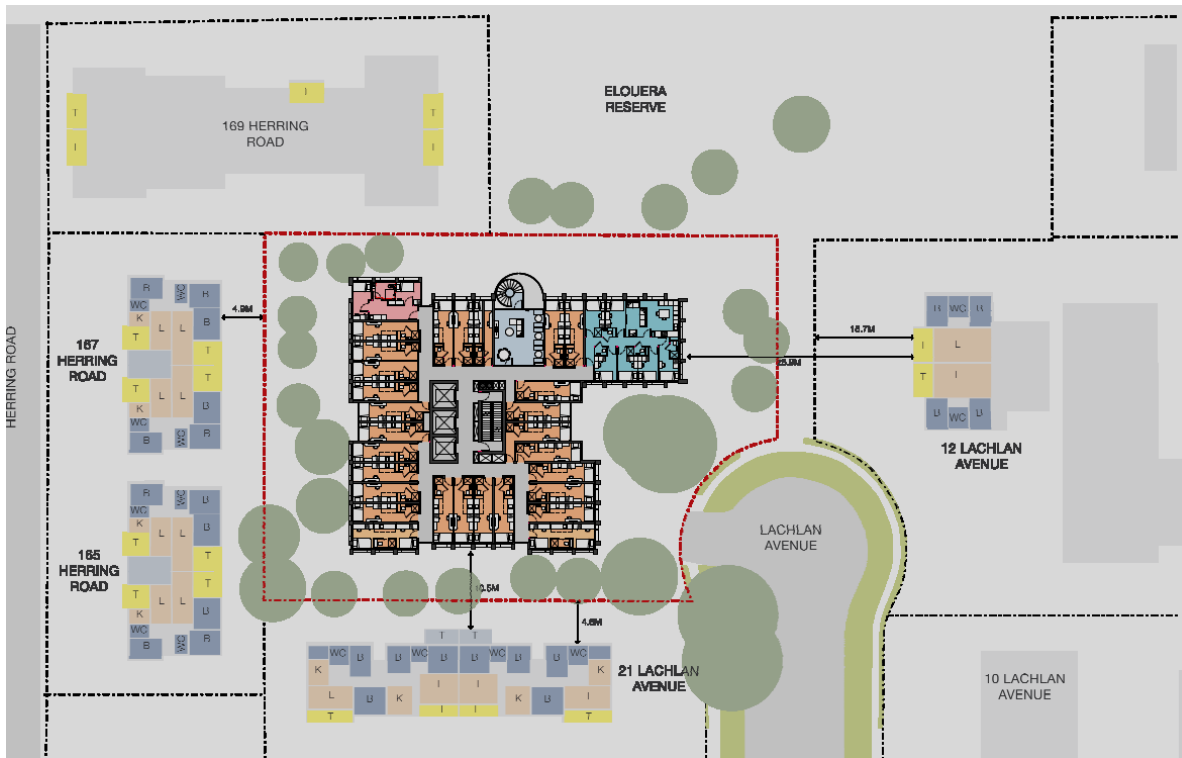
Extract from the Site & Surrounding Sites Plan showing the proposed development in relation to the surrounding residential apartment buildings. The potentially isolated site is shown on the left, Nos. 165-167 Herring Road.
